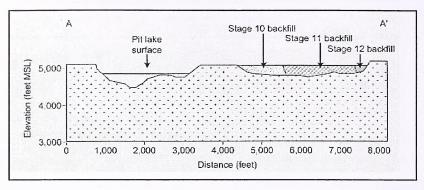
Stage 12 Cross Section A to A' through Pipeline/South Pipeline Backfilled Pit and the Gap Open Pit
